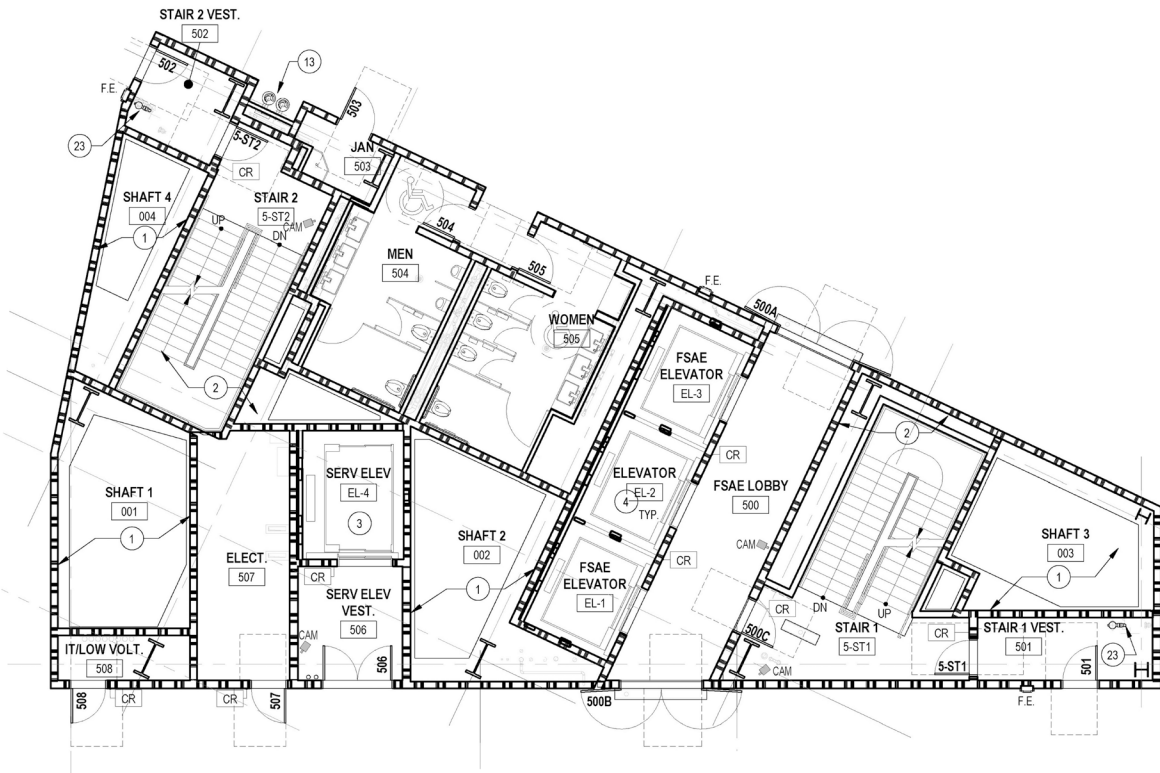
Project O typical plan of building core with level 5 as example (used with permission by Truebeck Construction 2023).
